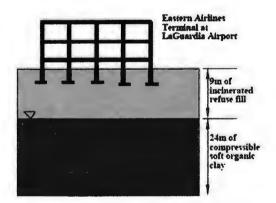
Schematic of U.S. Airways terminal constructed on shallow foundations bearing on highly compressible soil layers.
